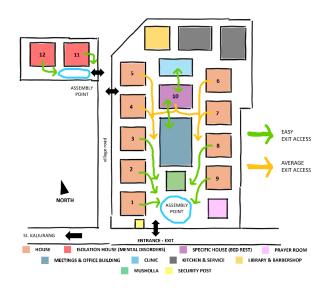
Recommendations for the Mass Layout of Buildings in BPSTW
